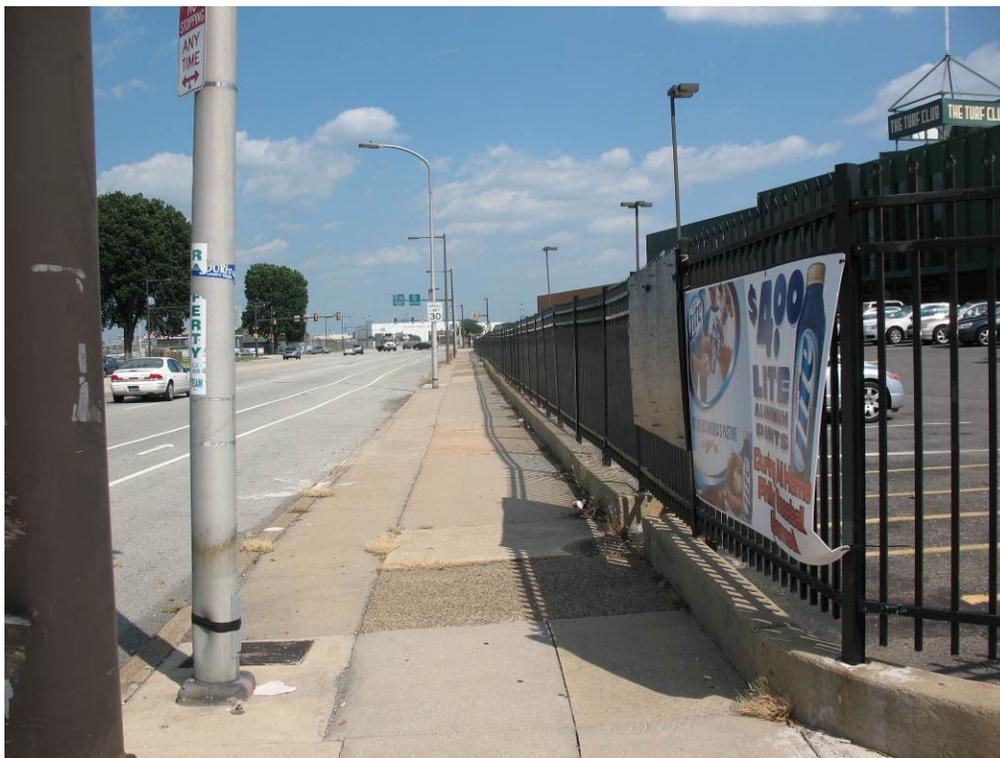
Sidewalk Along Packer Avenue East of S. Darien Street
